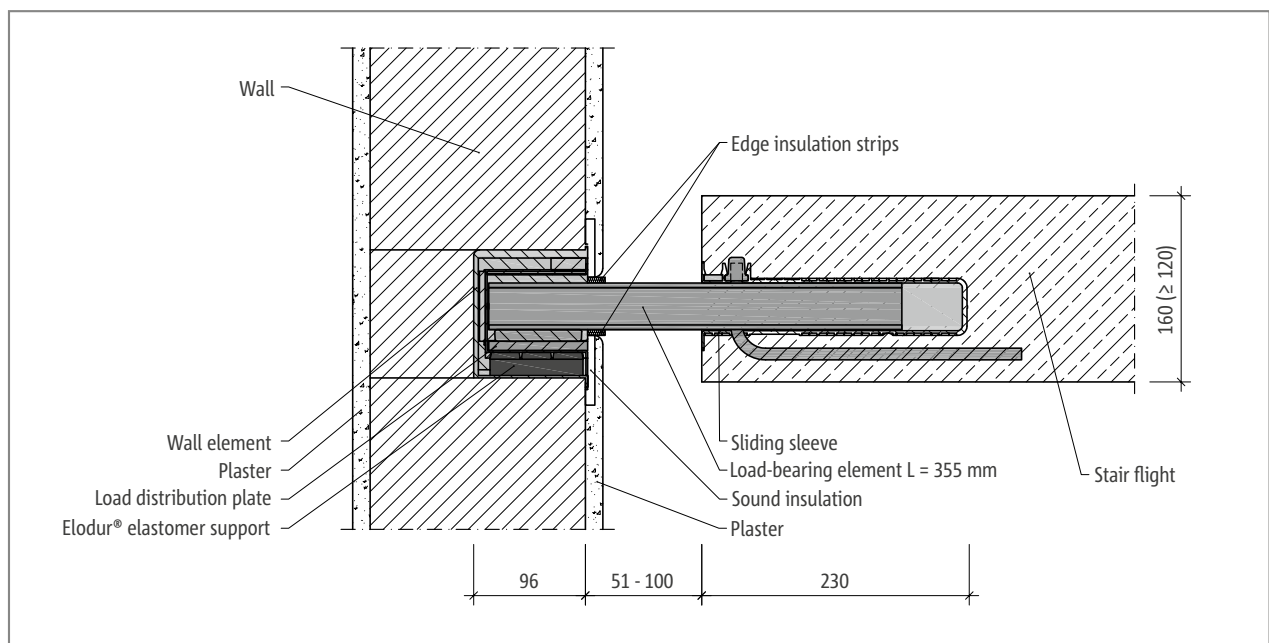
Schöck Tronsole® type Q-FV-XL or Q-A2-XL: Installation cross-section
